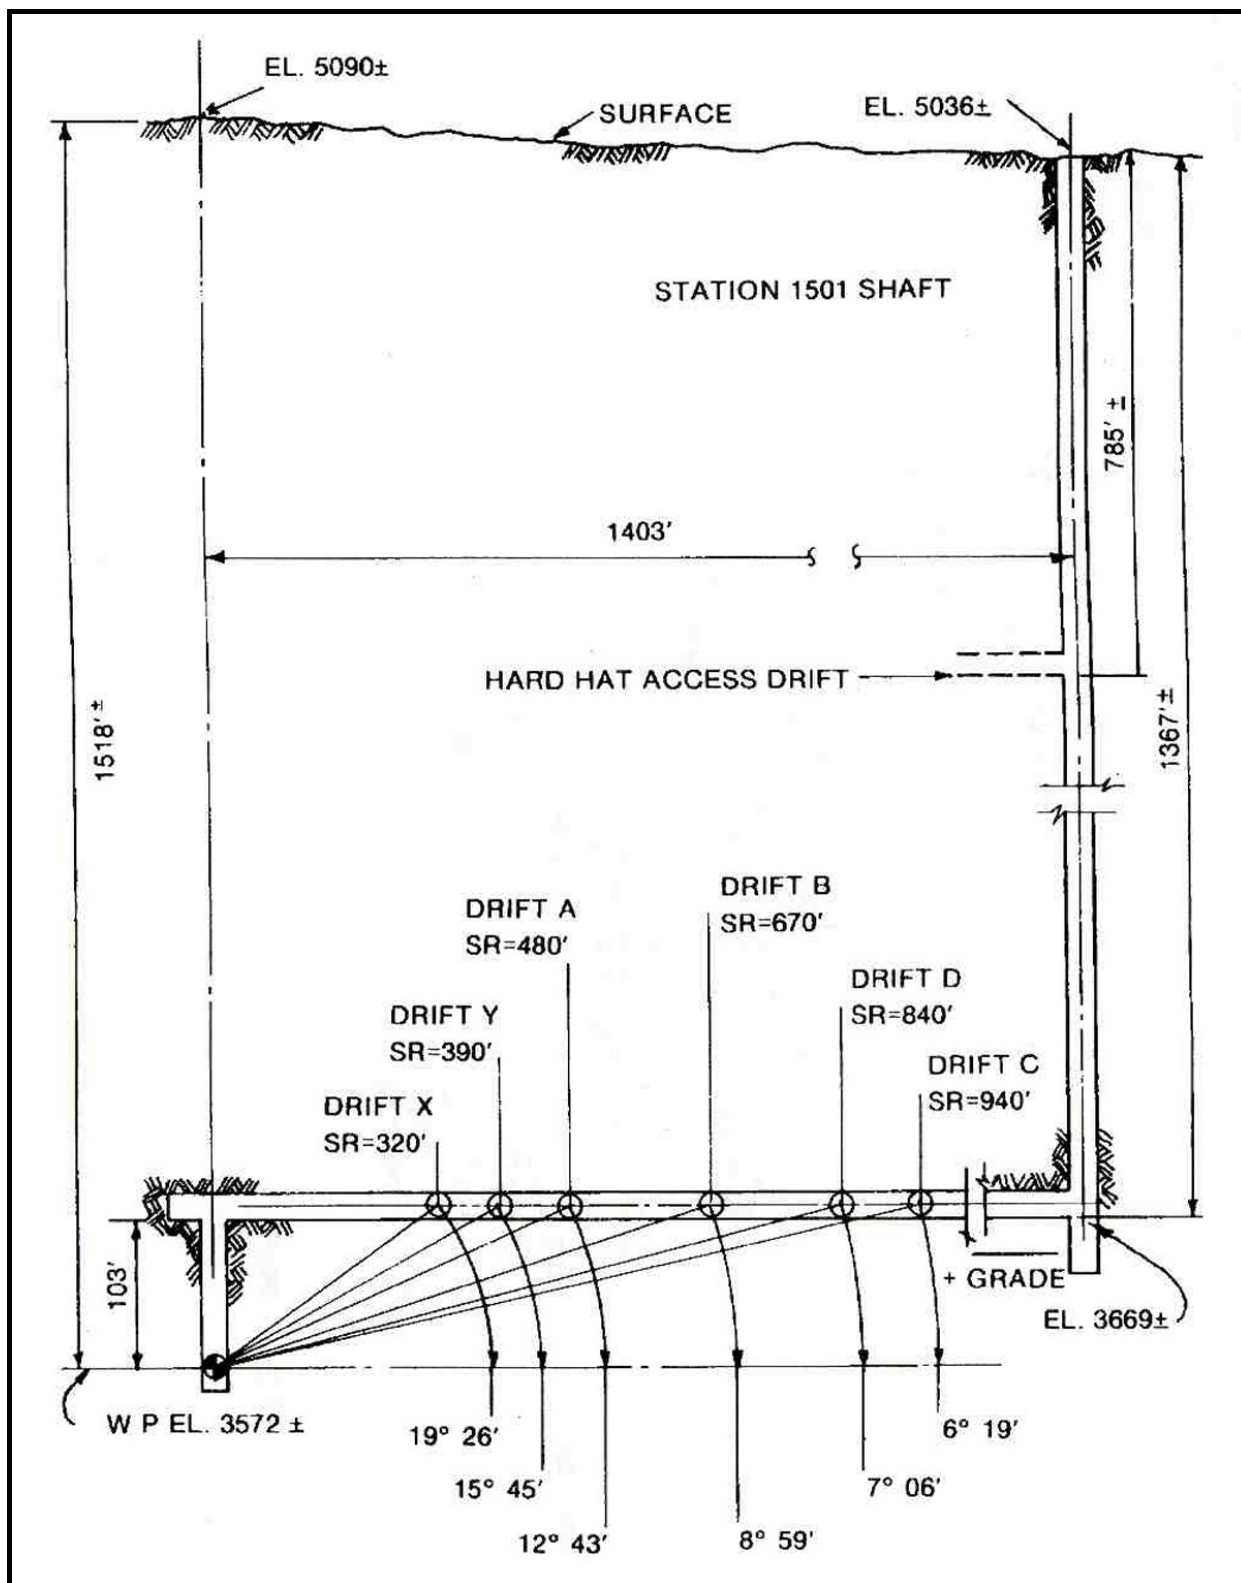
Profile of the subsurface layout for the Pile Driver nuclear test (Horton et al. 1984:129).
